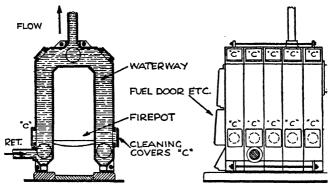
Typical Cast-Iron Sectional Hot-Water Supply Boiler. (Ratings up to 400,000 B.T.U./Hr.)
